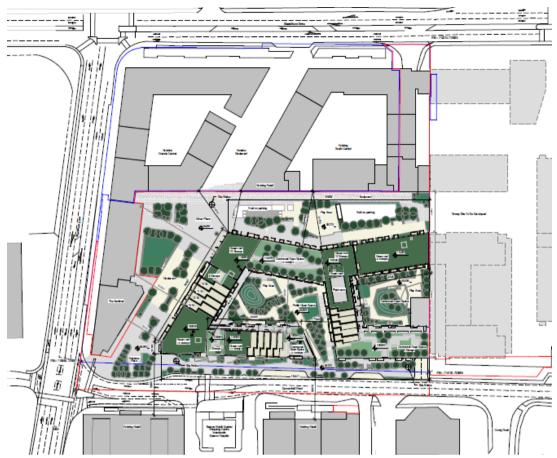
Development Site Plan (Source: TOT Architects)
